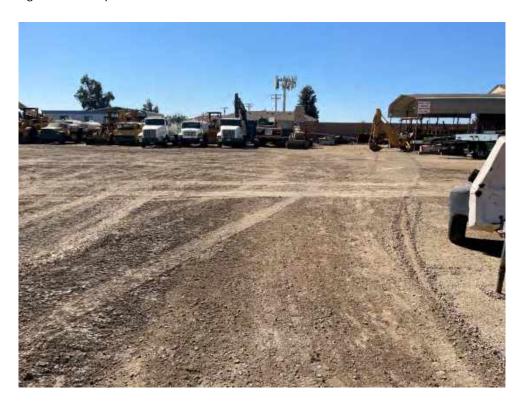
View of the soil under the former location of the steel plates on the southwest portion of the site facing south on September 22, 2021.
